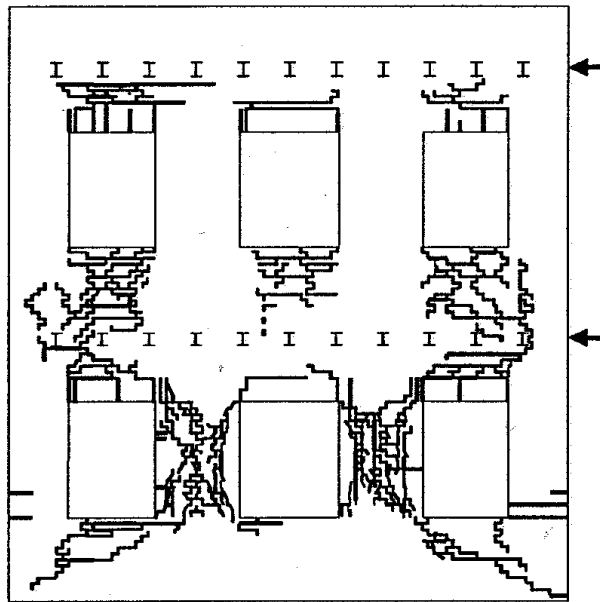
Crack observed in the spandrel of Wall B (Magenes et al. 1995)
